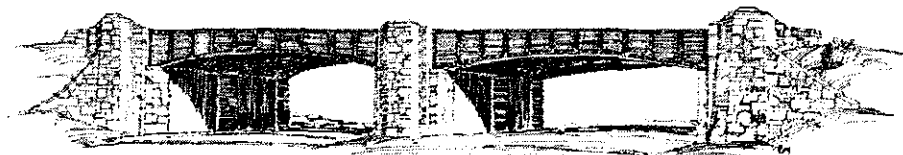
Architectural elevation of underpass at the Richmond, Fredericksburg & Potomac Railroad
